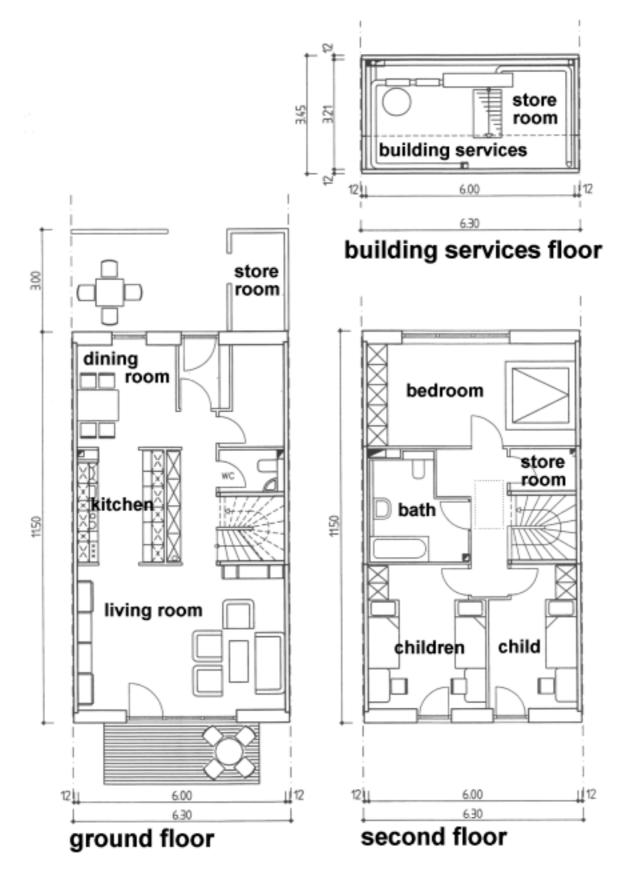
Floor plans for the house type Jangster de Lüx (Kronsberg Passive Houses)
